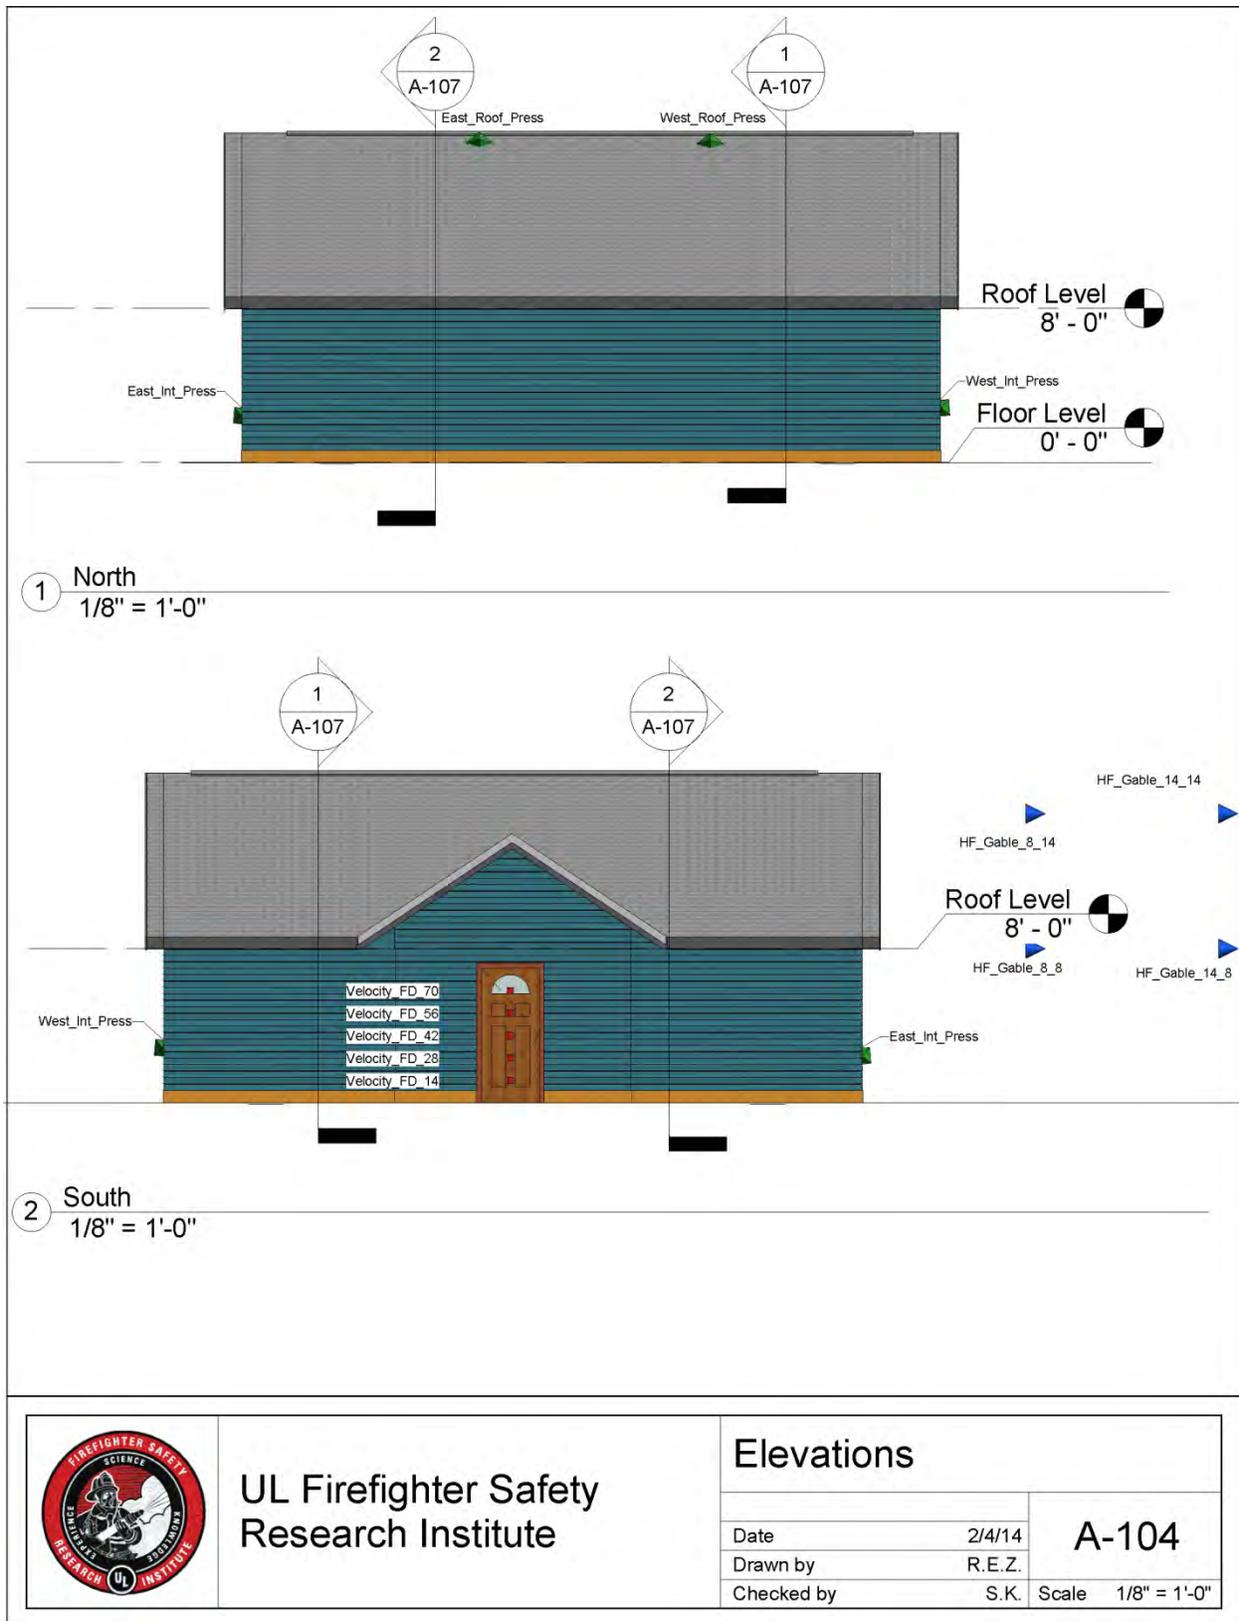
Full Scale Attic Sensor Elevation Views Front & Back
